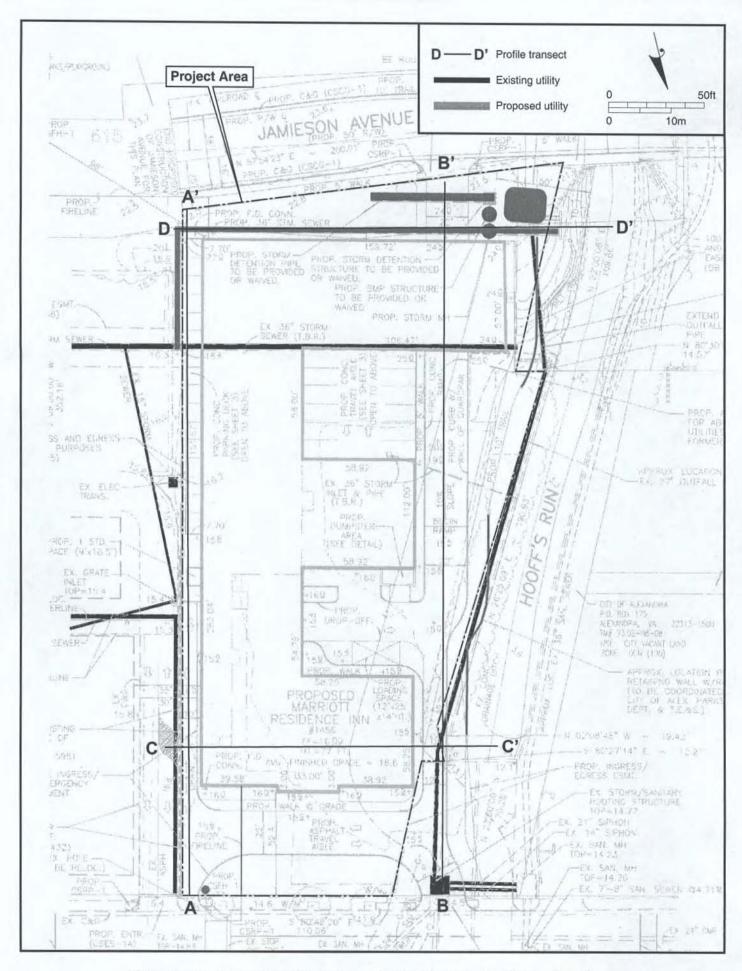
Site development plan showing existing and proposed utilities and profile transects (R.C. Fields, Jr., and Associates 1999).
